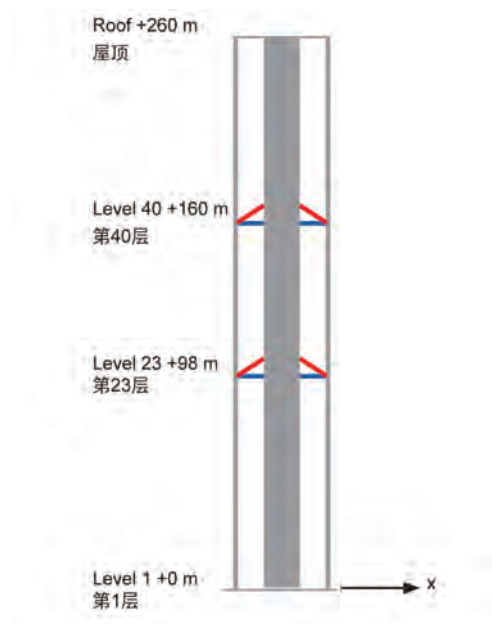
System diagram. Concrete core walls are linked to perimeter columns at two double-story height (8.4 m tall) mechanical levels. Outrigger elements (red) are typically large steel braces; BRB and FVD alternatives are considered in this study. (Source: Halvorson and Partners)
